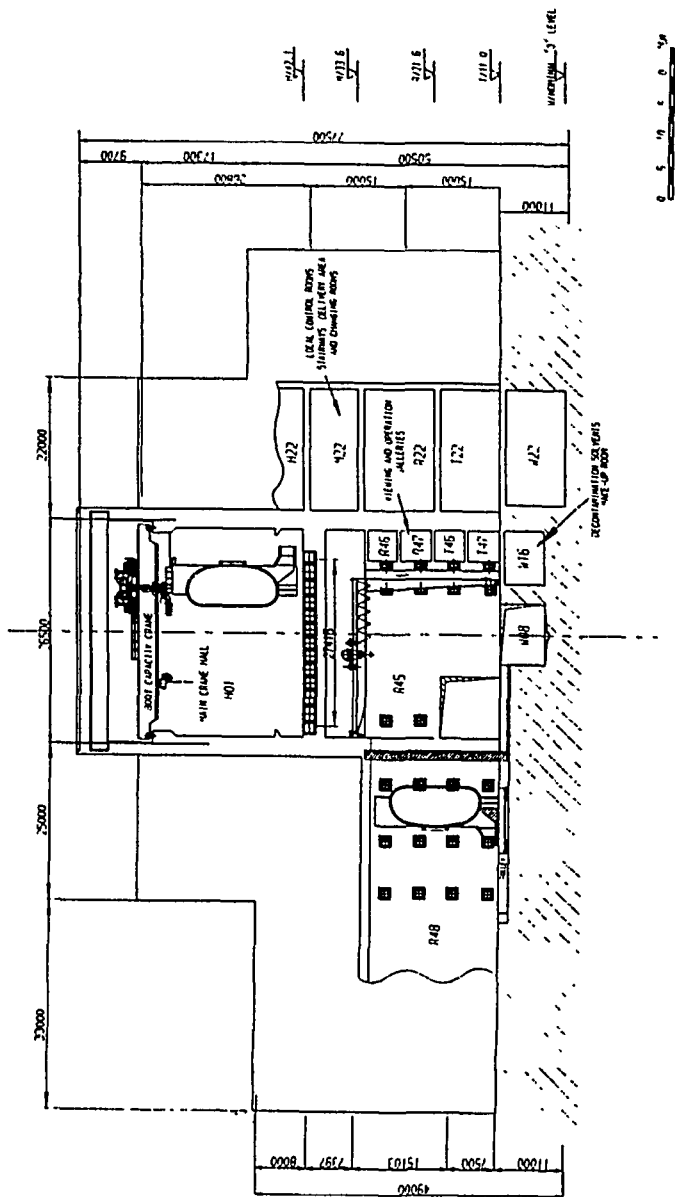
Basic requirement scheme elevation view (section C-C)
